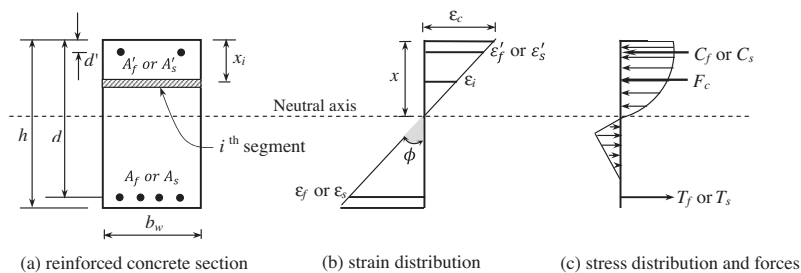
Strain, stresses and forces of concrete section reinforced with FRP or steel bars.
